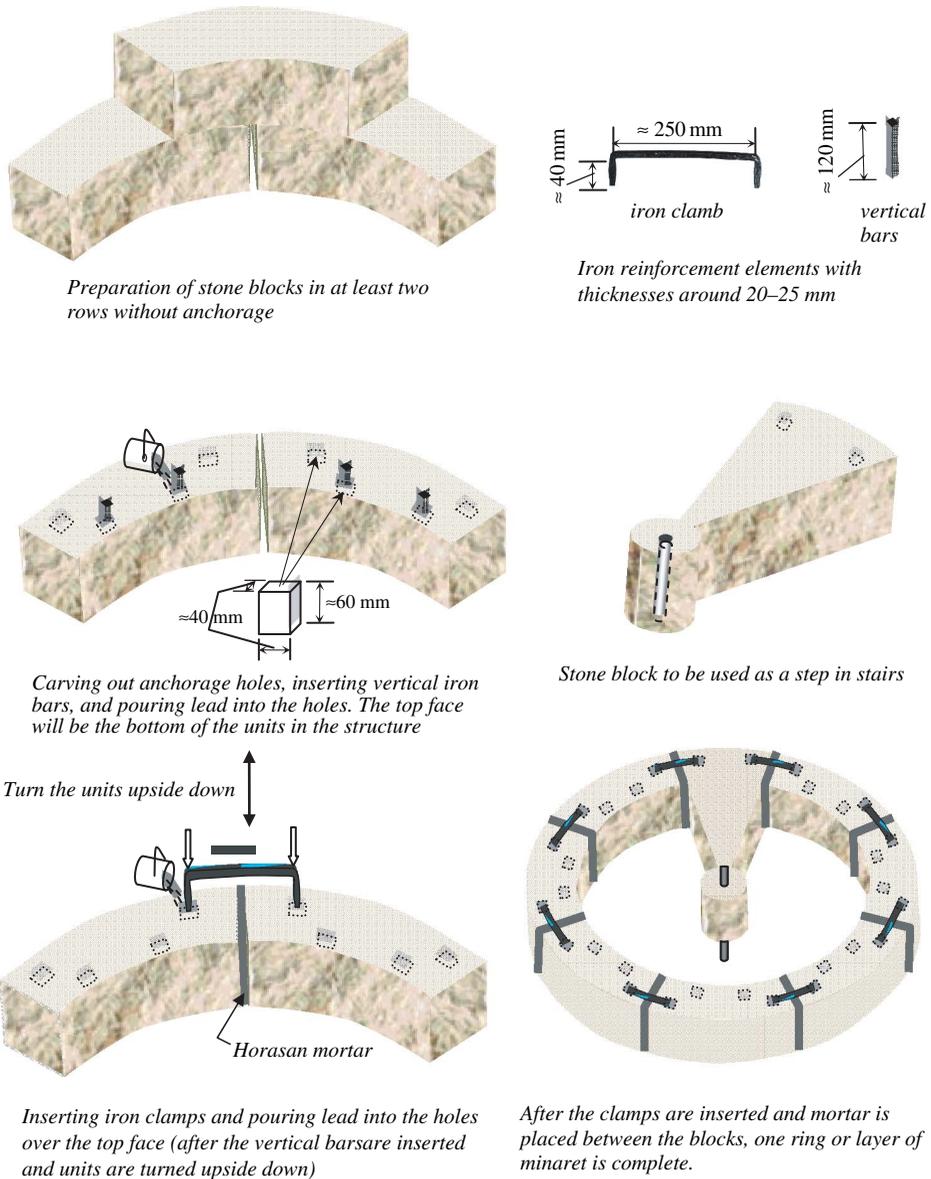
Schematic illustration of the construction of traditional Turkish minarets using stone blocks reinforced and anchored with iron bars and clamps.
